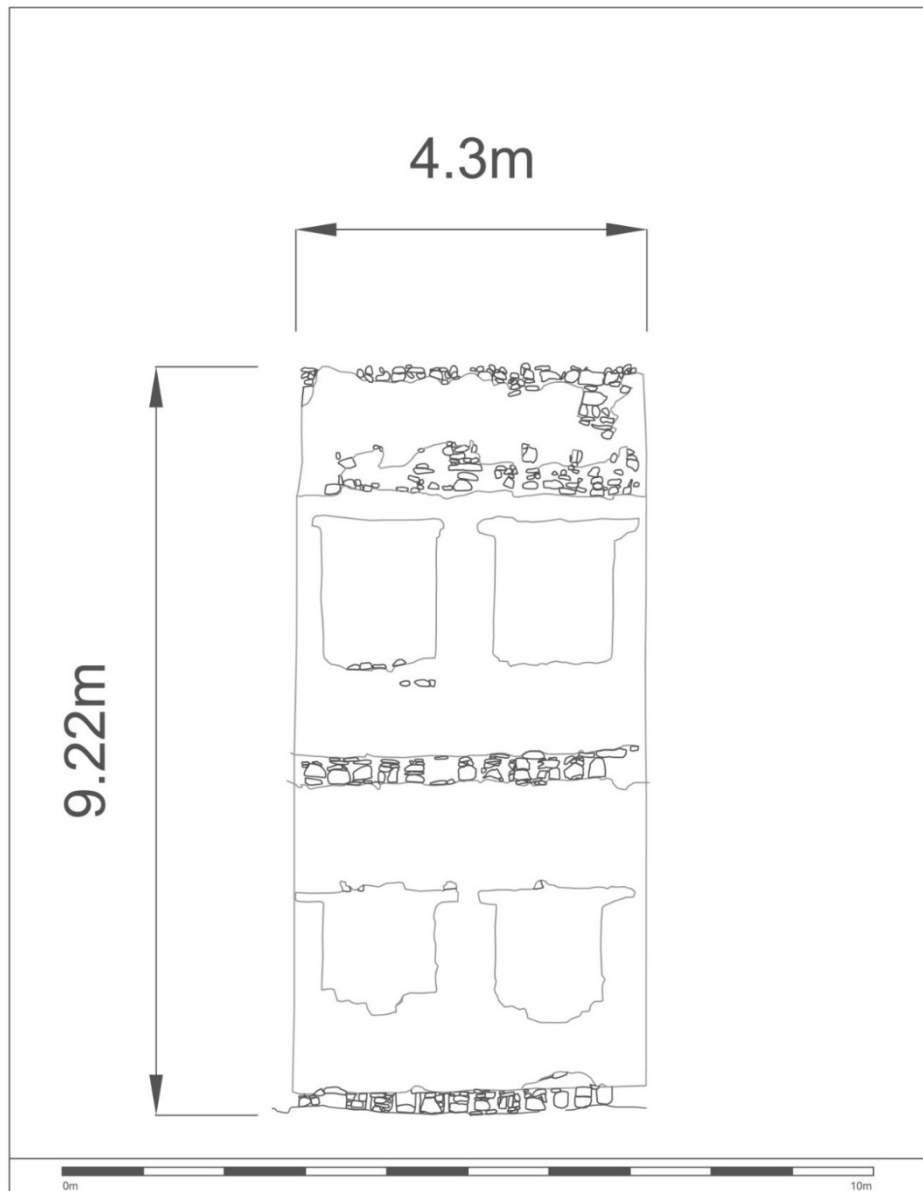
Internal elevation of the west wall of the signal tower at Rathlee Signal Station.
